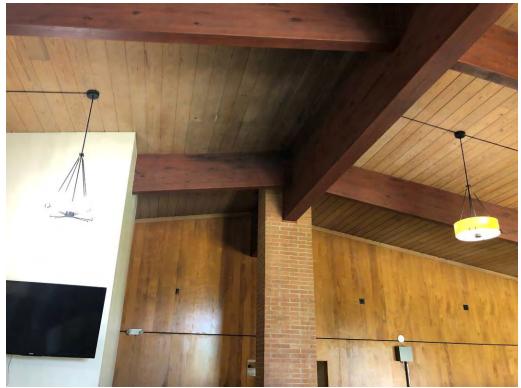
Decay at end of wood beam at lodge near fireplace.
